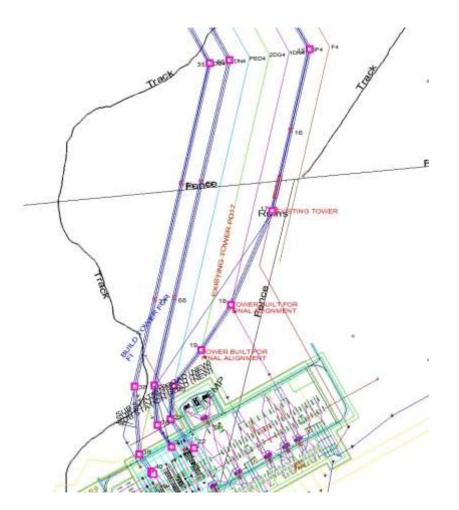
Development plan indicating the proposed construction sites and relevant access tracks that must be used.
